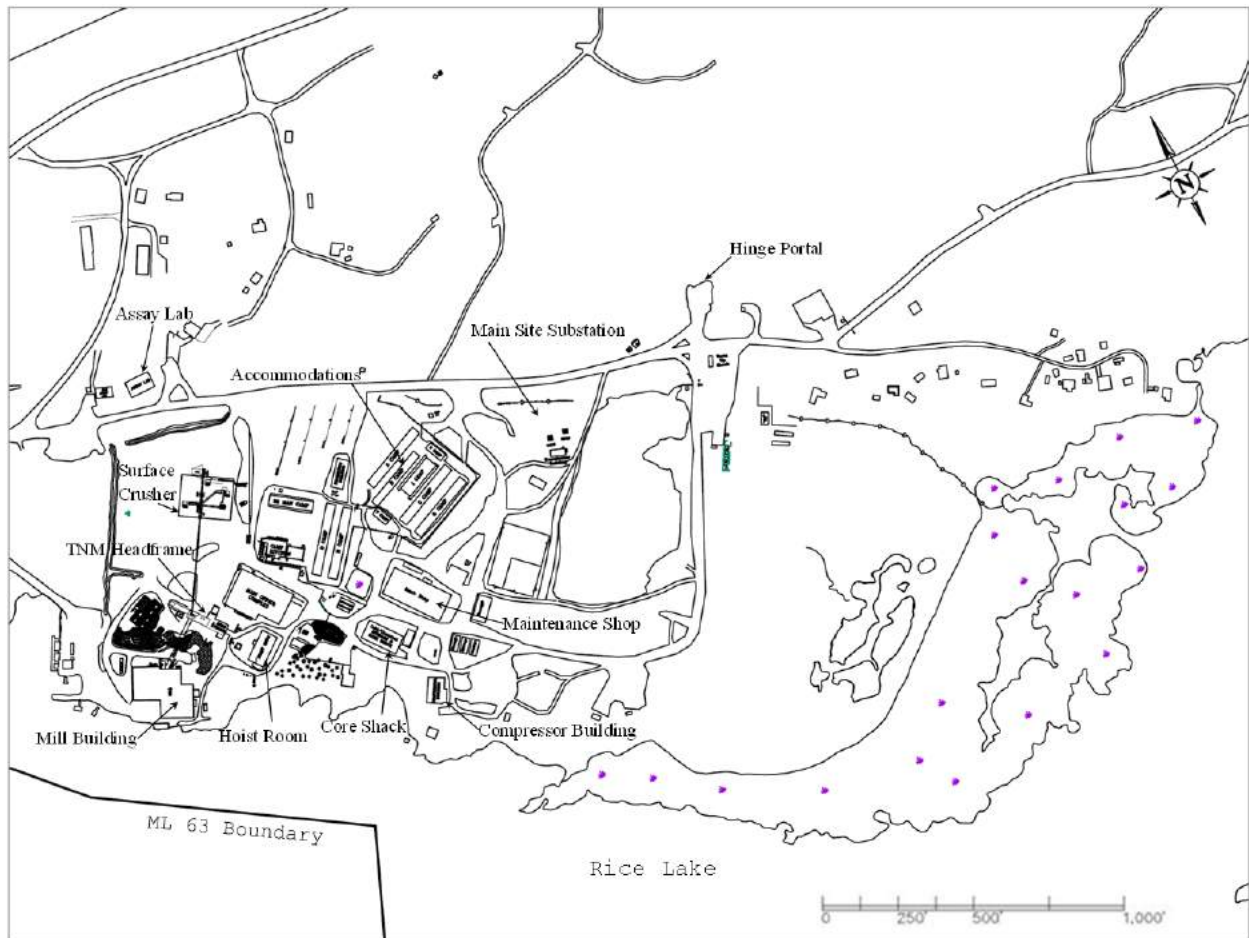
Tailings Pond Facility at the True North Gold Mine
